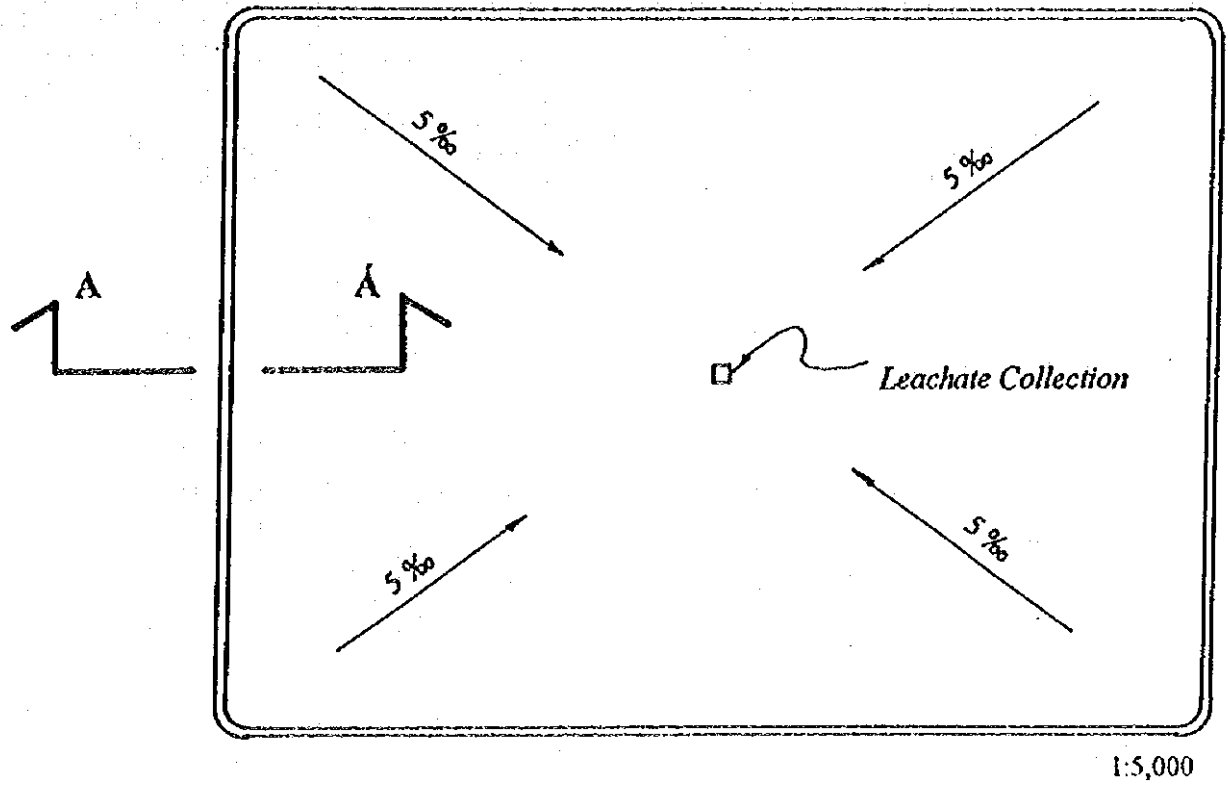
Plan of Laying Impermeable Sheet (Source: COMCO)
